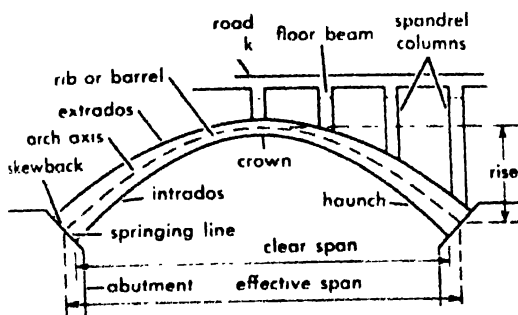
An open-spandrel, concrete, fixed-arch bridge.
